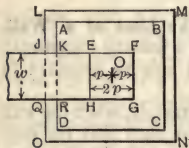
Square Supporting Area. Isolated Load on End of Wall
